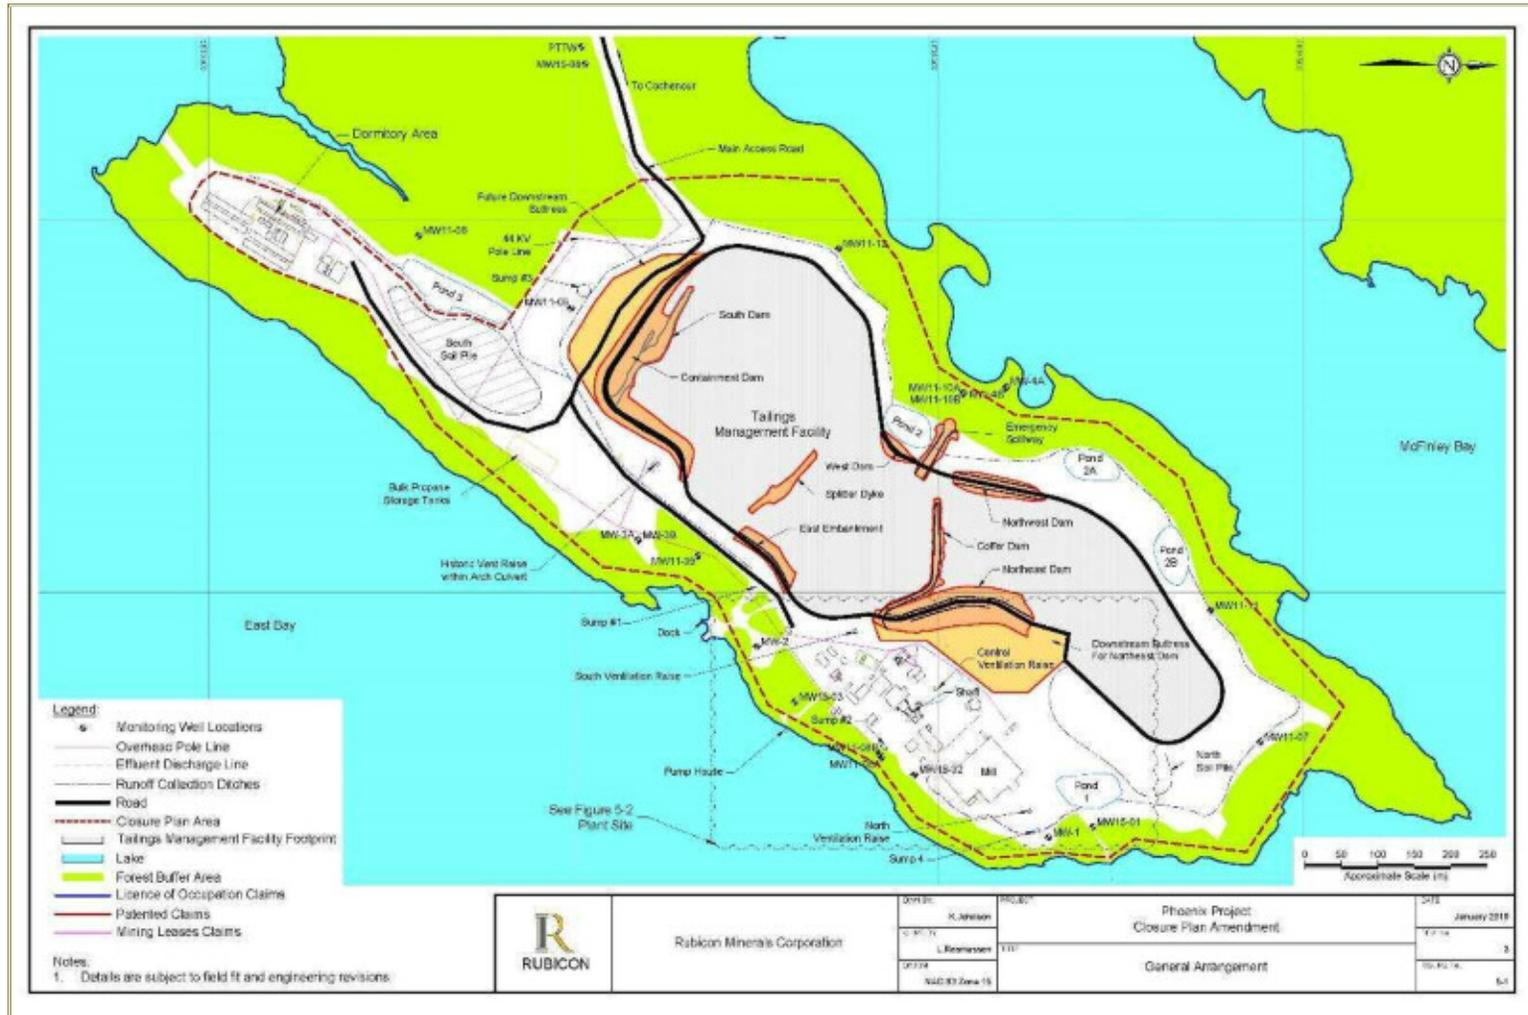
Detailed Site Plan of Project Area (Source: Rubicon, 2019)
